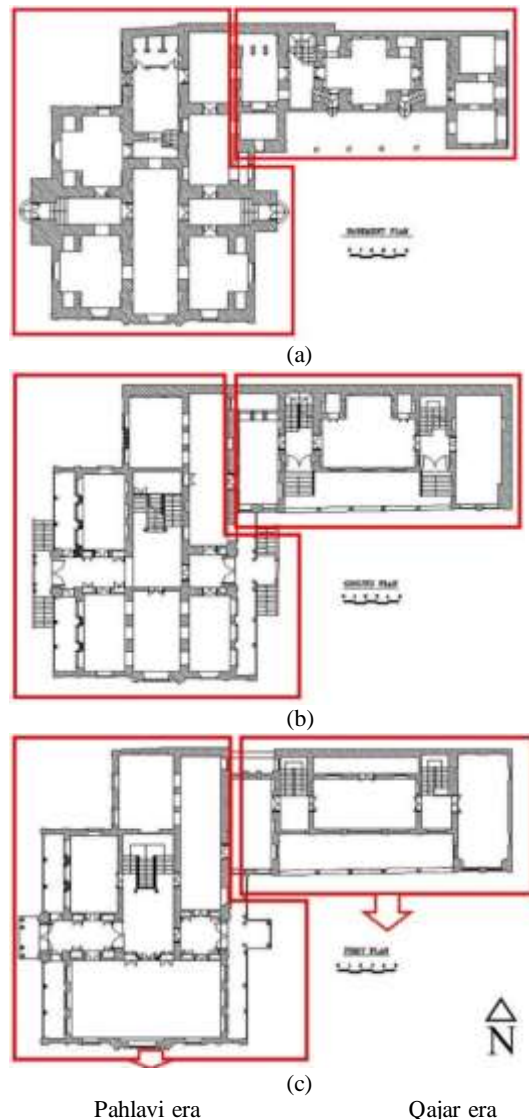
(a) Basement, (b) Ground and (c) First Floor Plan (Source: Cultural Heritage, Handicrafts and Tourism Organization of East Azerbaijan Province, 2020)
